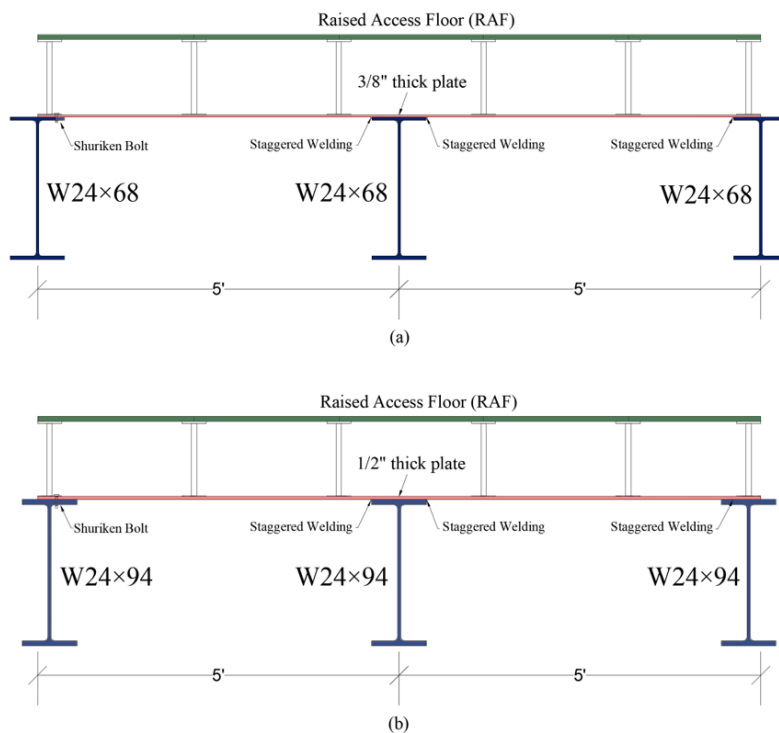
Sectional view of the 10 ft x 40 ft single FastFloor modules used in vibration serviceability evaluation. (a) Section of the light specimen (SM68_RAF). (b) Section of the heavy specimen (SM94_RAF).
